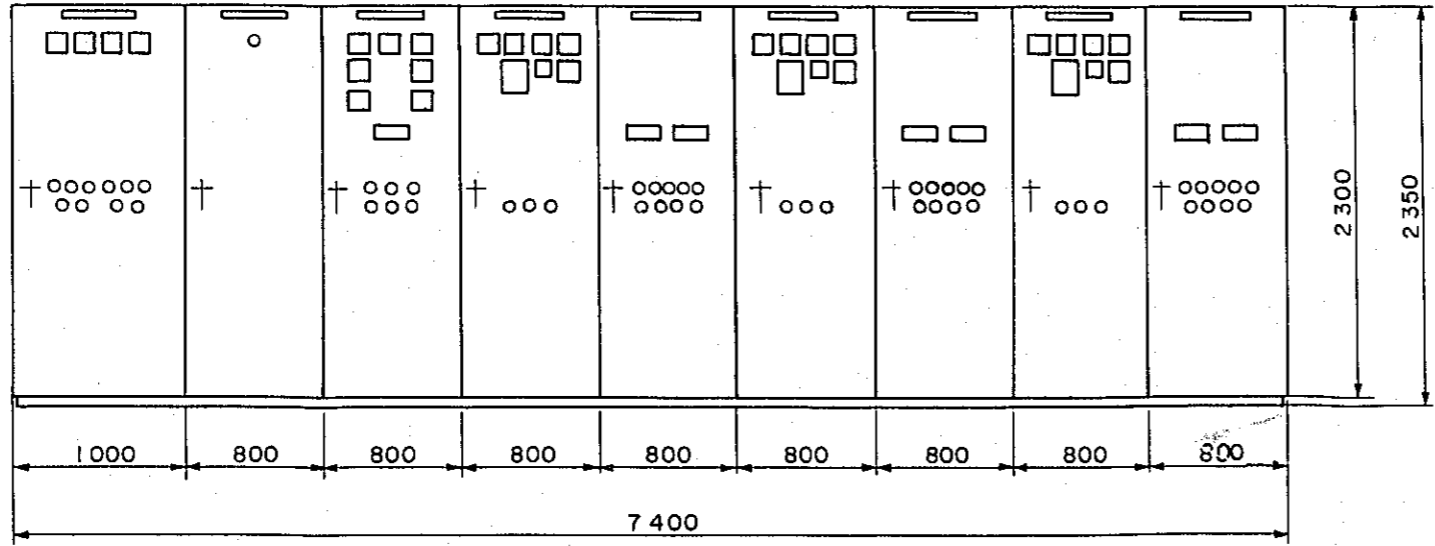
OUTER VIEW OF GENERATOR CONTROL PANEL & FEEDER PANEL
